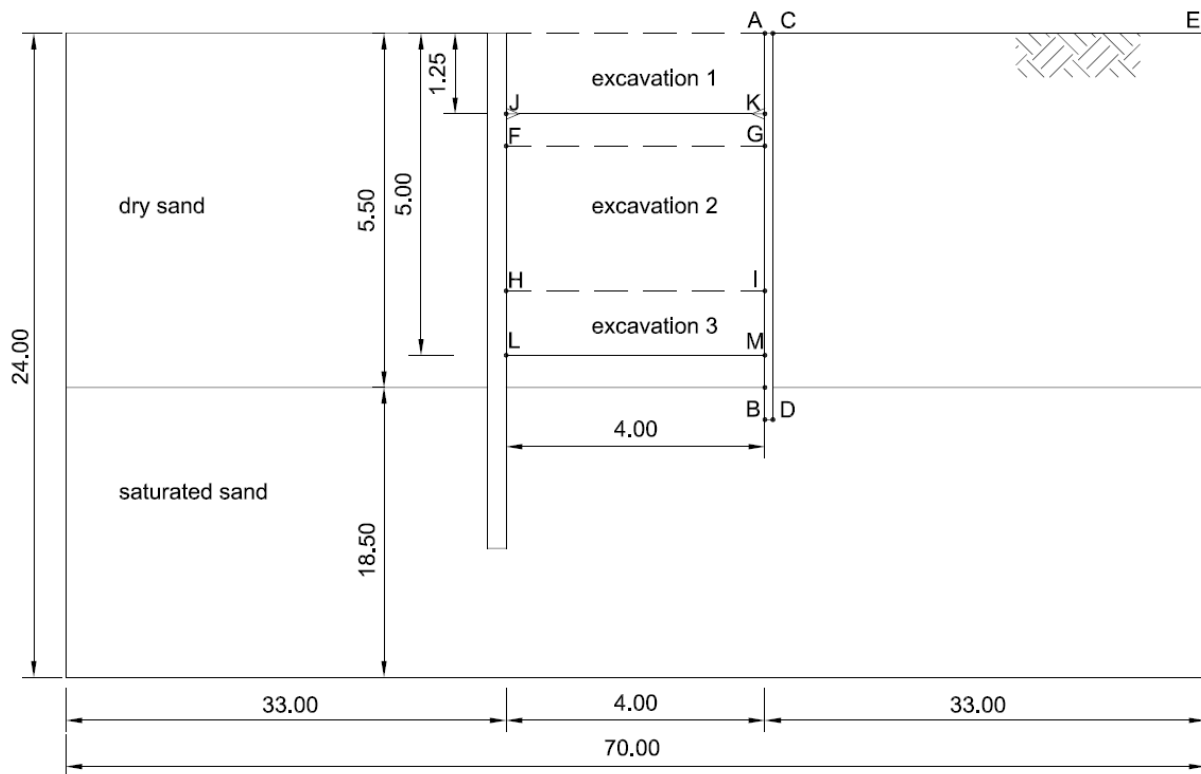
Karlsruhe braced sheetpile excavation: FE model plan.
